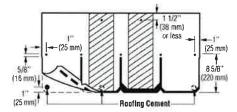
When installing Grand Manor Shangles on steep slopes, use seven nails and three spots of asphalt roofing cement.
